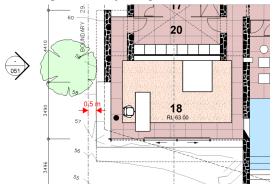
Proposed setback of south-wing master bedroom balcony setback 0.5m (Source: HSA)
